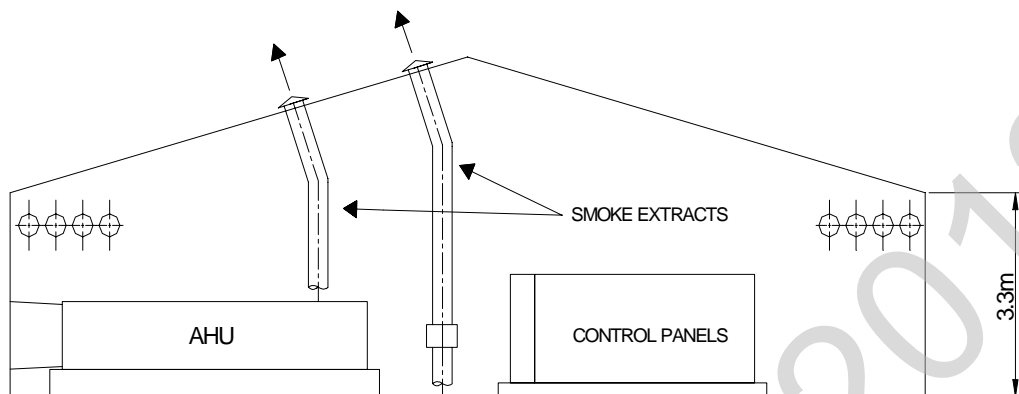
Typical plantroom 6 serving 24 hr accommodation department
